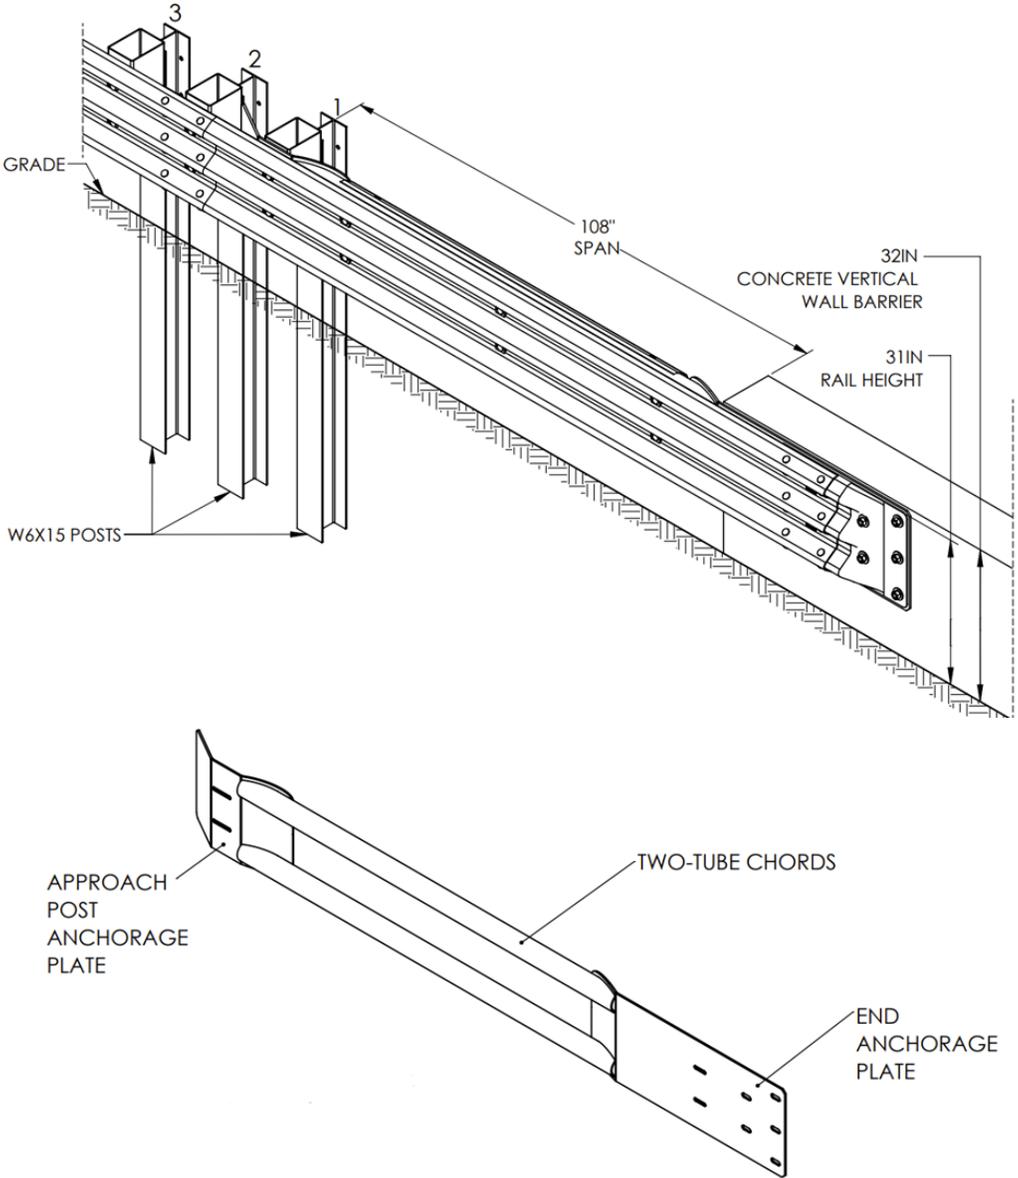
Schematics of Final Long Span Structure Connection [14]
